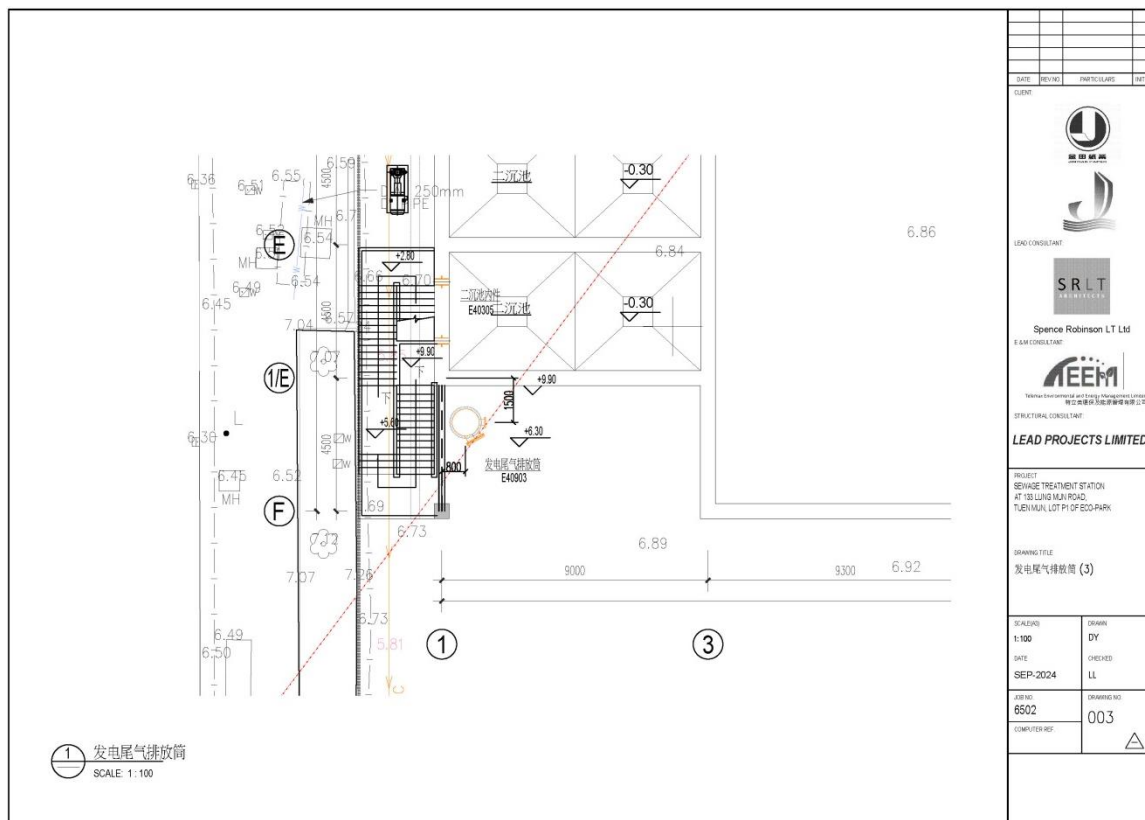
Fume Exhaust Pipe on Roof Level & outside Chimney Restricted Area
